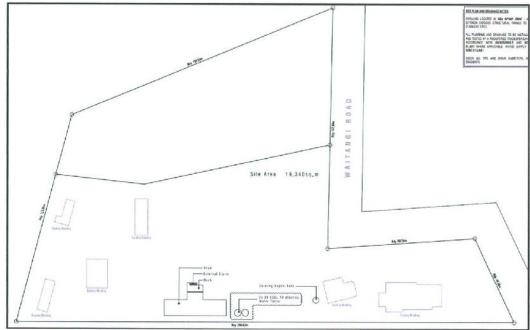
The site plan update from JT Design Architecture Limited (TRIM File: 59548#0274)
